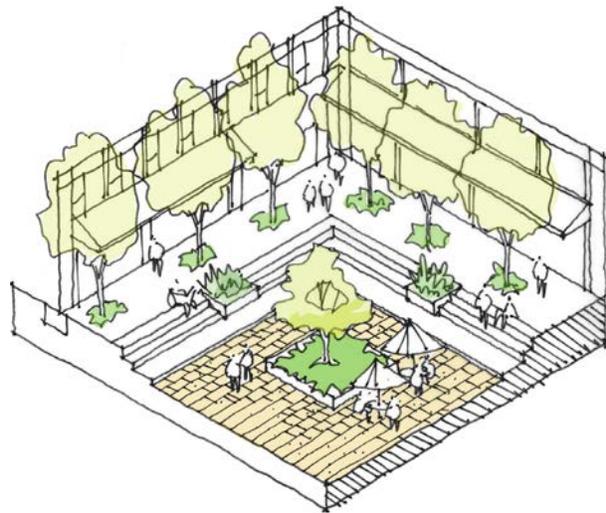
d.2: Public plaza with pervious paving for improved stormwater management
